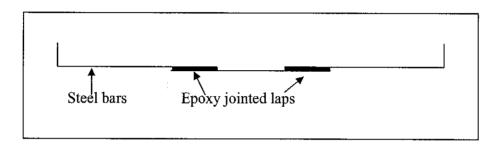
Proposed design of epoxy jointed steel bar laps
